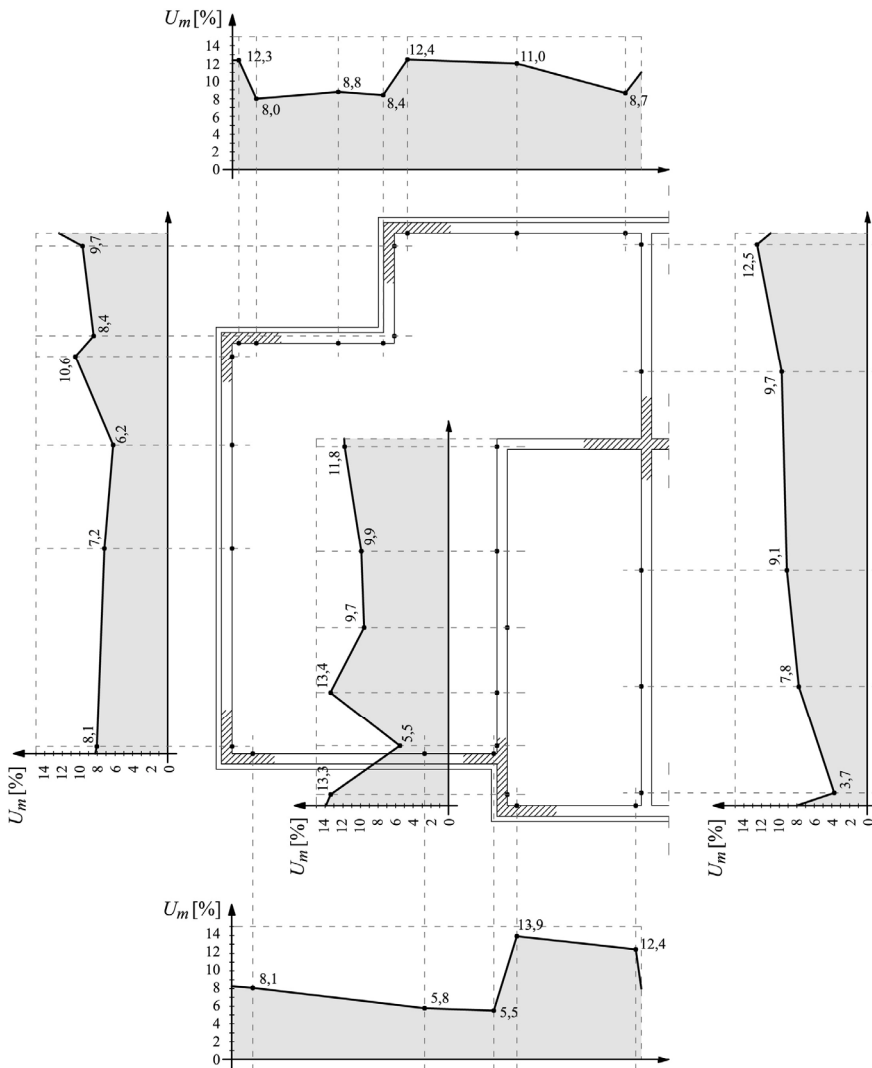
Moisture content by wt U_m in masonry in ground floor walls of one of tested residential buildings, determined by nondestructive method at height of 5 cm above floor topping.
